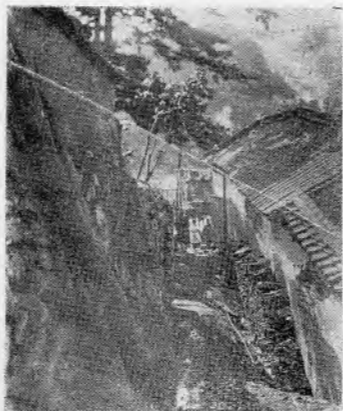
Broken houses and swelled out retaining wall on the fissure line.
